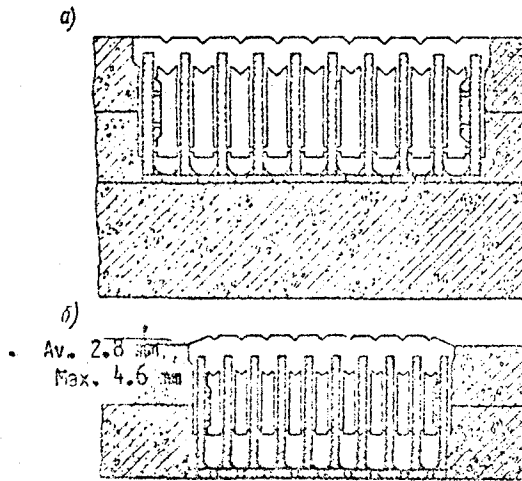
FILLING THE JUNCTIONS OF PRESTRESSED PREFABRICATED MONOLITH PAVEMENTS WITH RUBBER, REINFORCED WITH STEEL STRIPS: a) DESIGN OF THE JUNCTION
